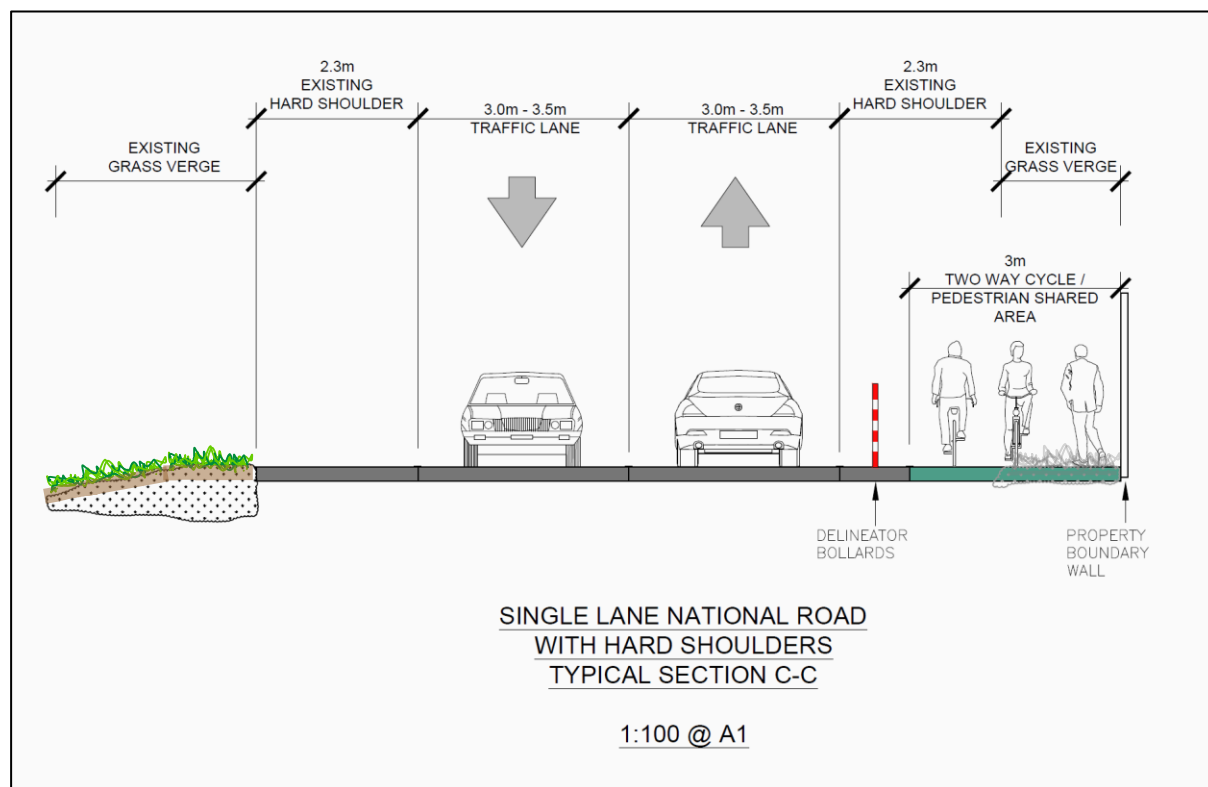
Worked Example 2 Typical Cross Section in constrained location
